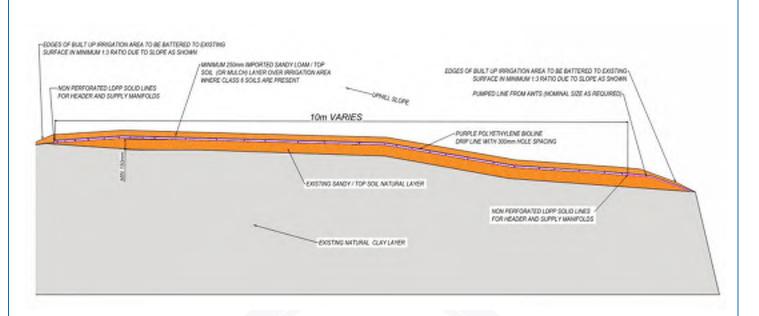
RECCOMENDED IRRIGATION CROSS SECTION DETAIL
